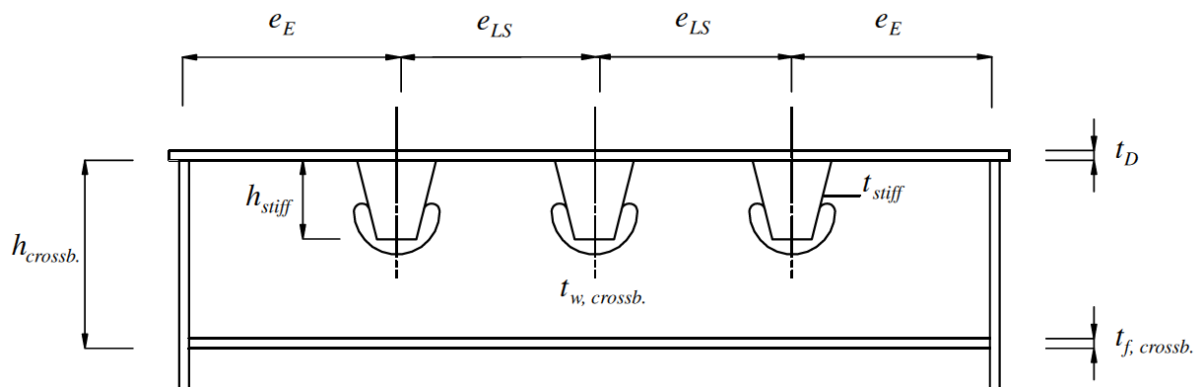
Cross Section of Orthotropic Deck with Relevant Properties Labeled<sup>57</sup>
